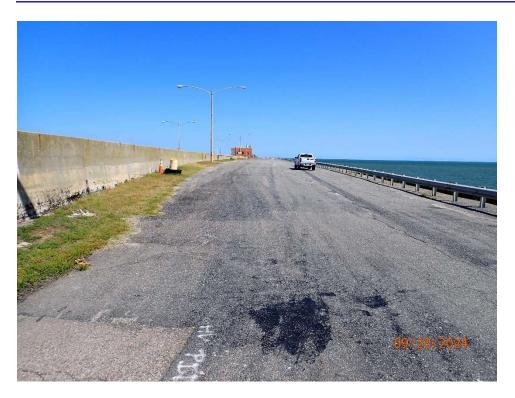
Portal Island 3; Surface; Typical pavement condition on east side of island.
